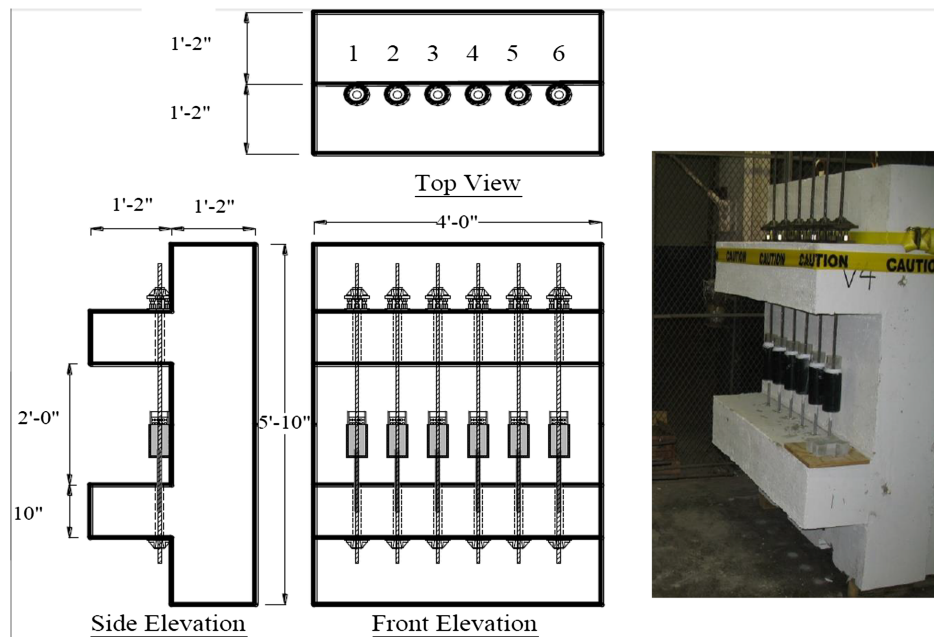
Concrete reaction frame with six stressed-strand specimens
